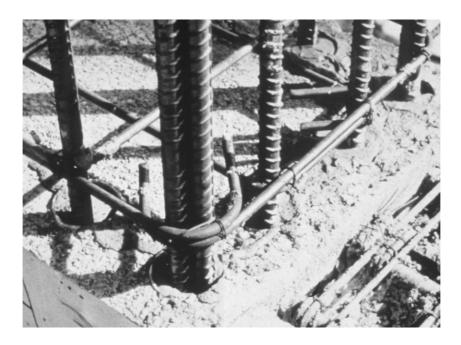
Column bars after being grouted in the joint core (Courtesy of J. Restrepo)
